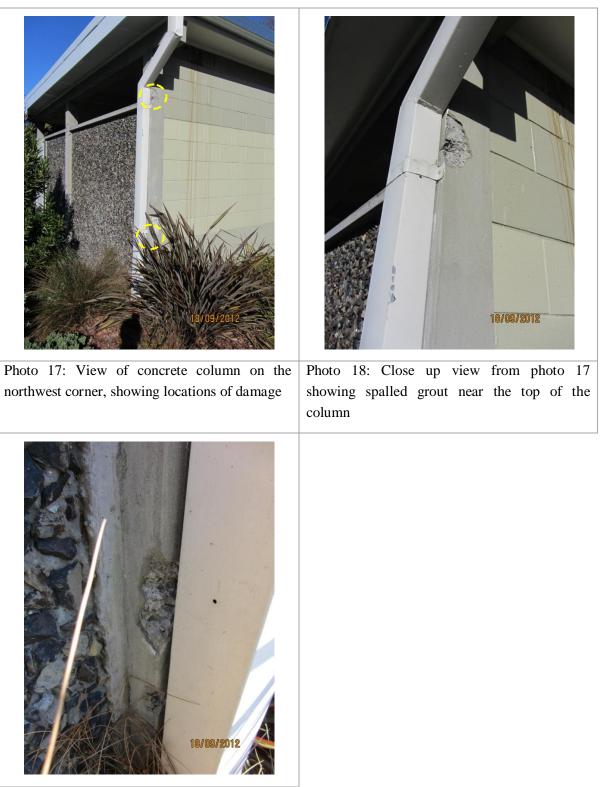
Close up view from photo 17 showing spalled grout near the bottom of the column
